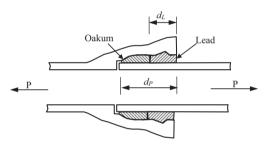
Schematic Drawing of Bell-and-Spigot Lead Caulked Joint.
